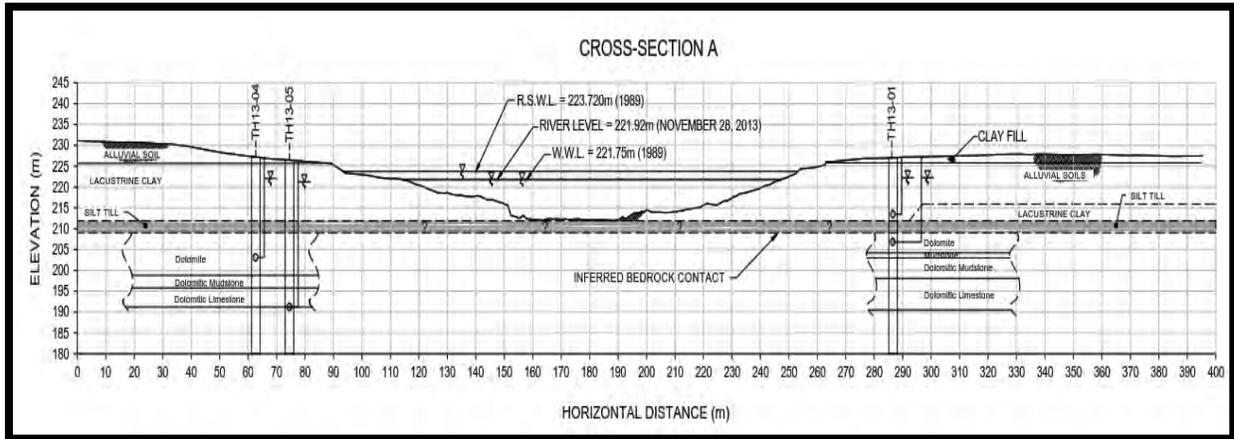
Cross Section “A” taken from TREK Geotechnical 2014 North Kildonan Feedermain Geotechnical Report
